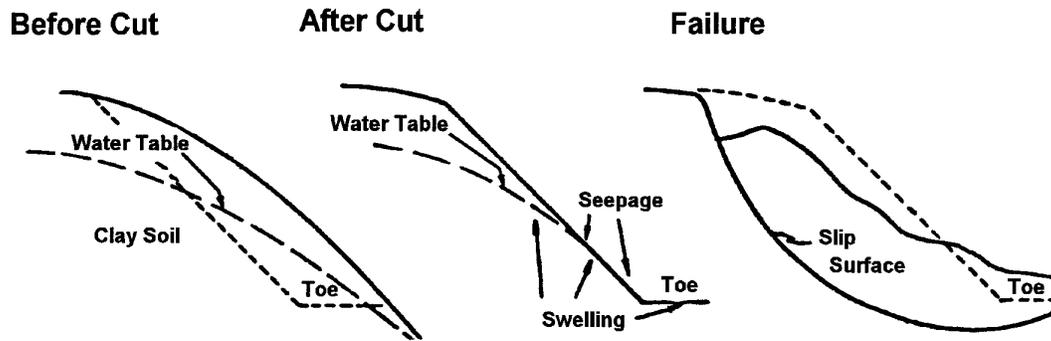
Typical Cut Slope Failure Mechanism in Clay Soils
